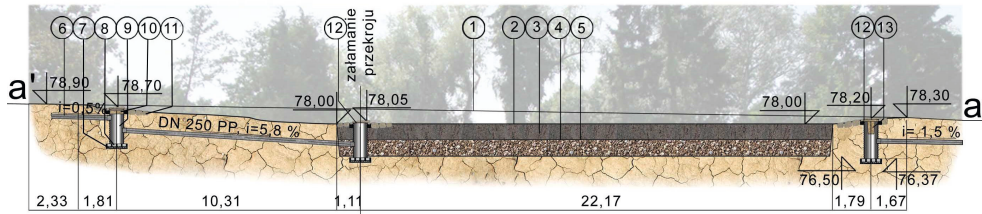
Scheme of the rainwater collection system in the Park in Żelazowa Wola: pipes direct rainwater away from the roofs of two pavilions, and roads or parking places, to the bioretention cell (author: P. Wolski). The technical project designed by the Design Office Stapiński-Instalprojekt, Lublin; the revitalization of the Park in Żelazowa Wola created by the Stelmach & Partners Design (elaborated by: M. Widaj and M. Wyrwicki).
